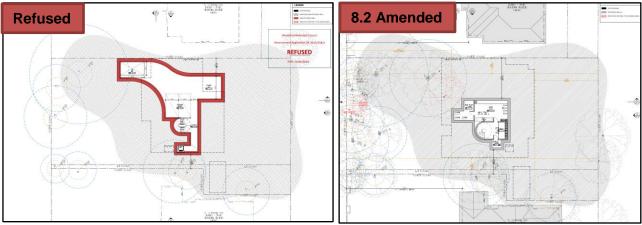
(left) & 2 (right). Refused and amended Basement Plan. Source: Refused and Amended Architectural Plans
